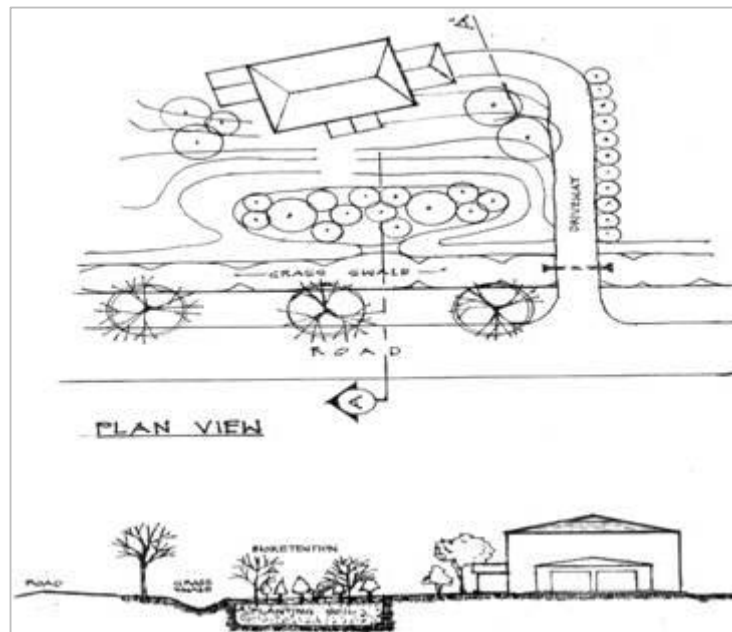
Plan view and cross-section of a swale-side bioretention area
